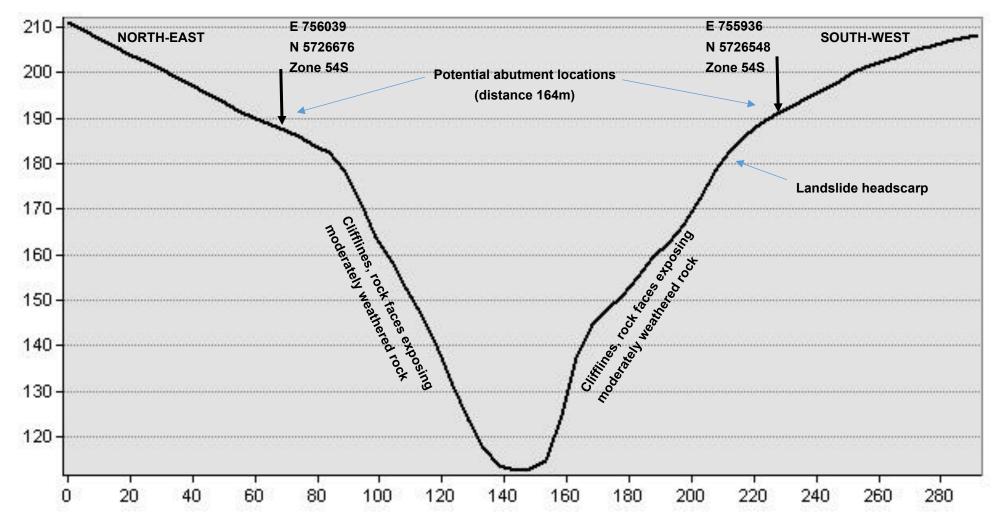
Cross section along proposed Bridge 4 indicating suggested abutment locations
